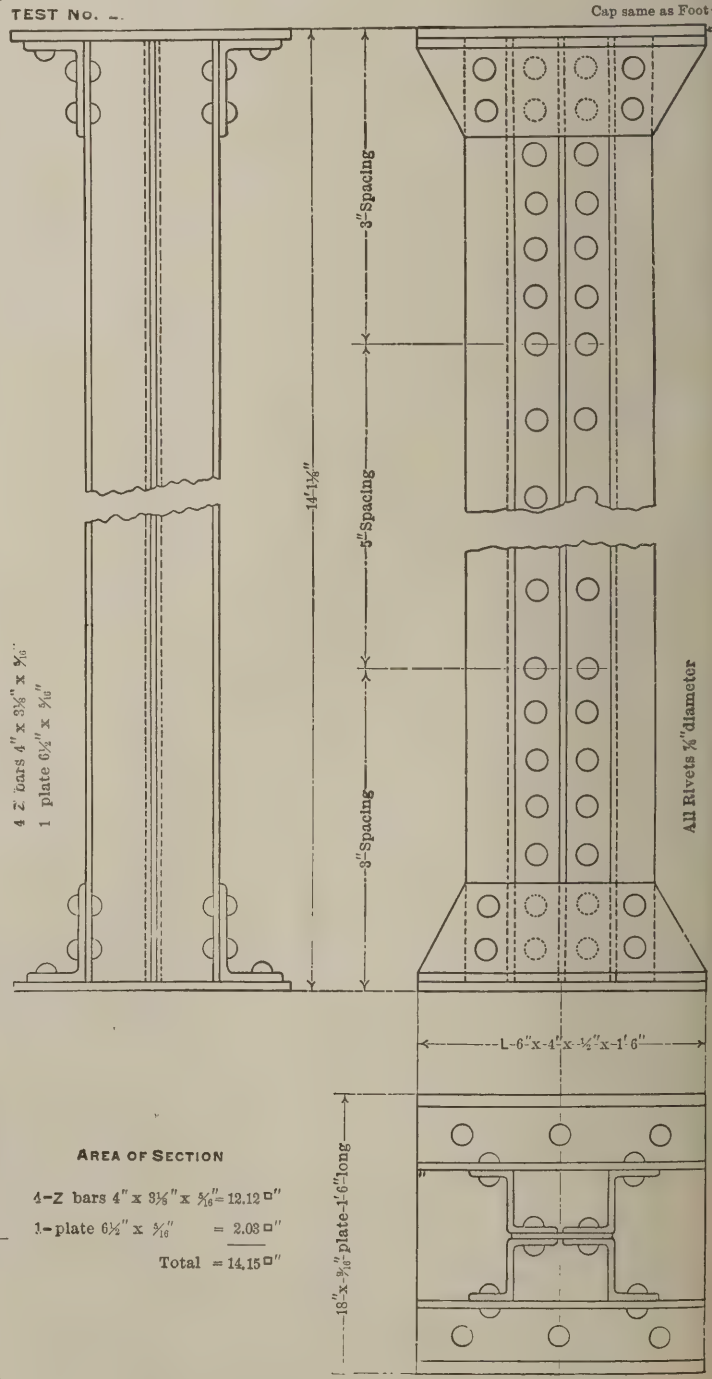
THE STANCHION USED IN TEST NO. 2.
